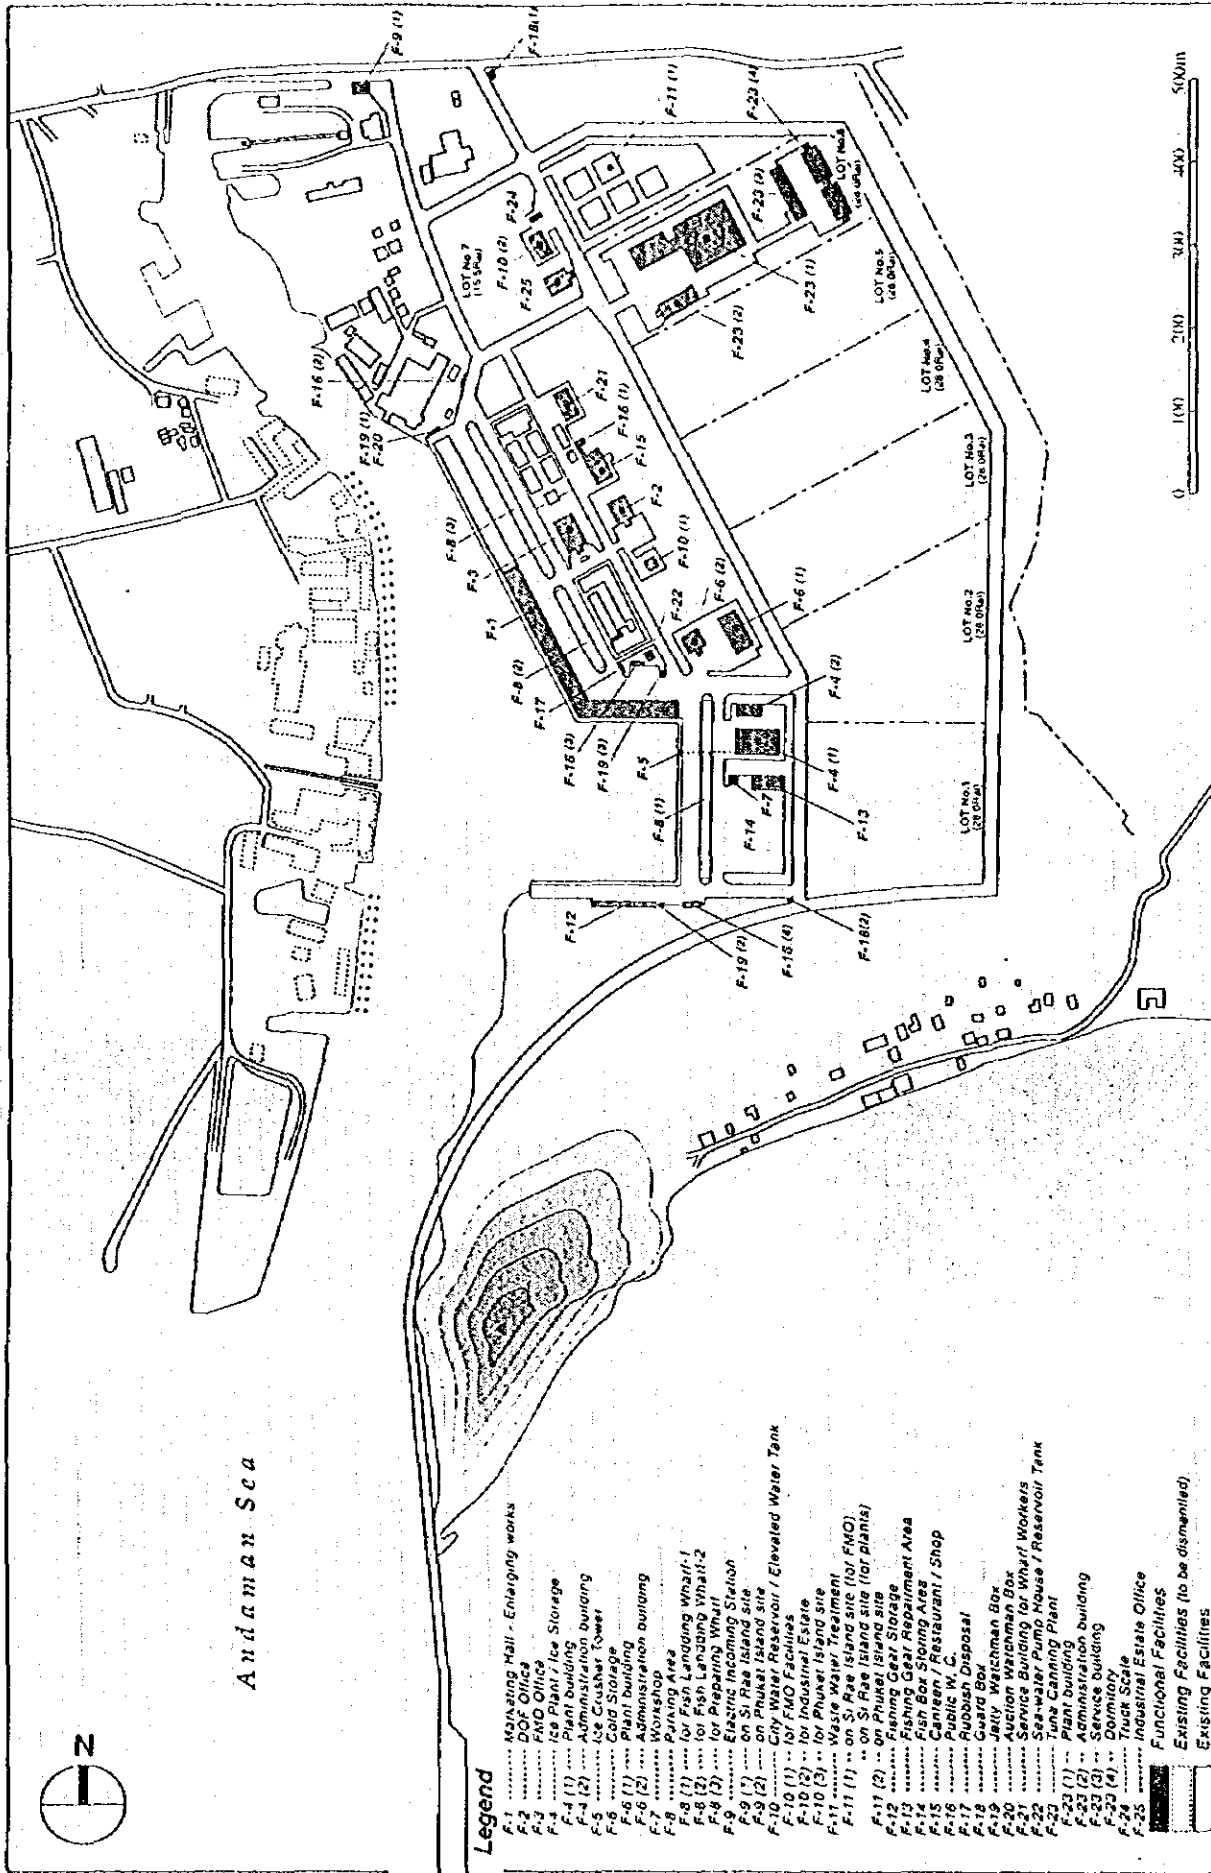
Detailed Layout Plan of Phuket Port
